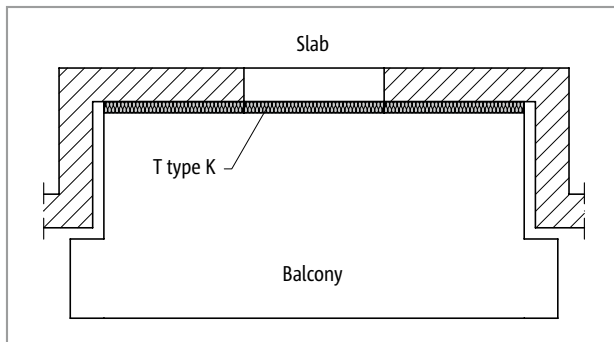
Schöck Isokorb® T type K: Balcony with facade recess
